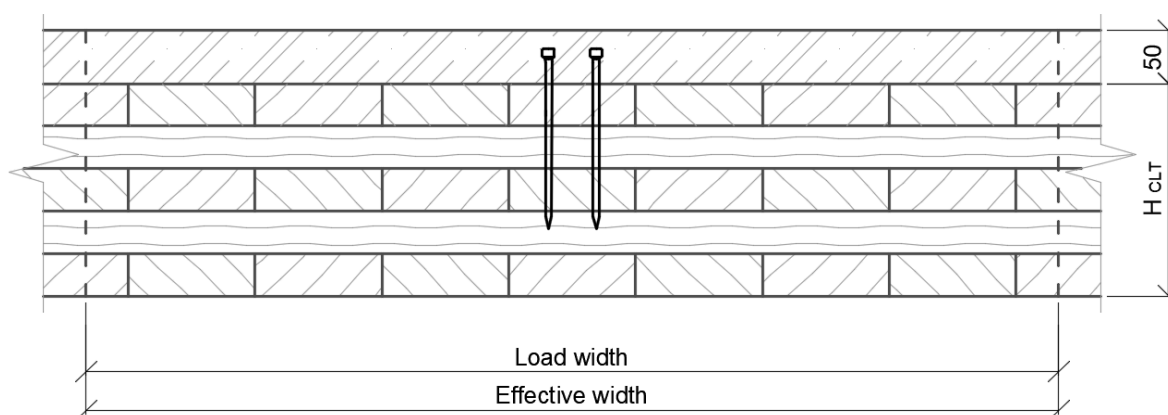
Cross-section of composite slab timber-concrete ceiling.
